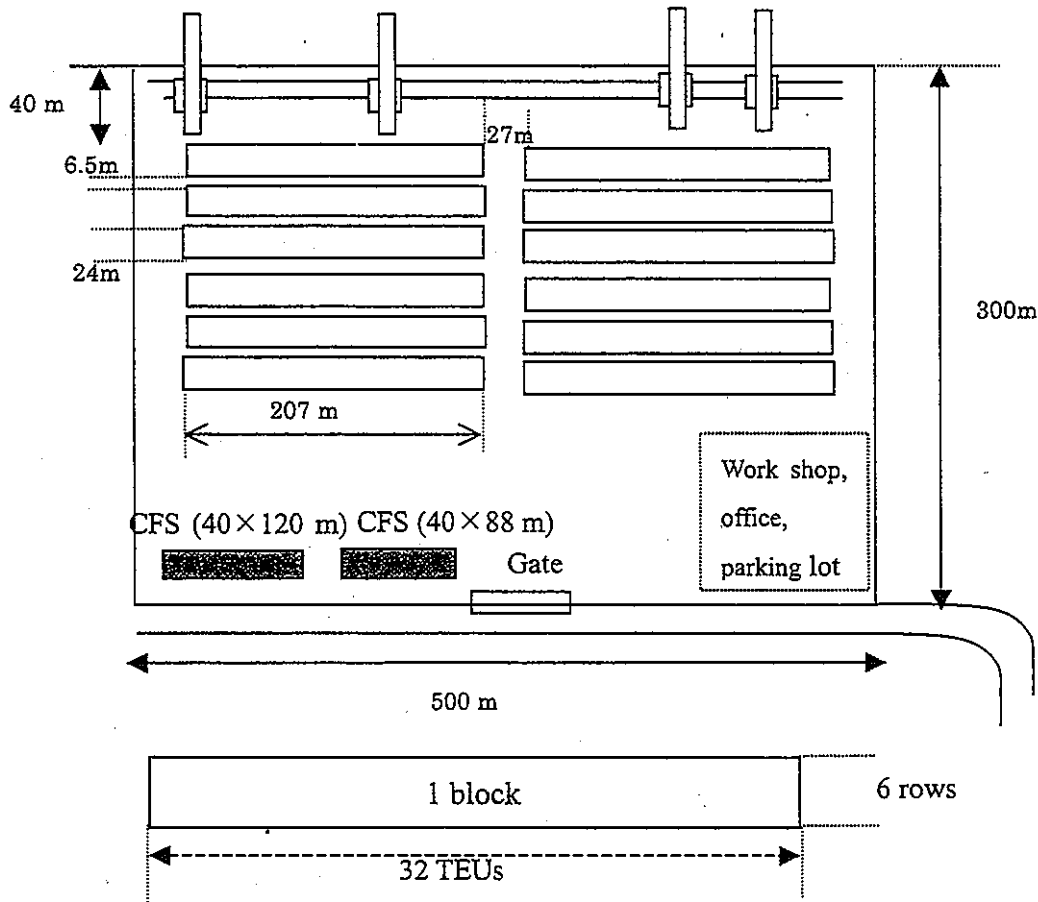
Layout Plan of Palaran Container Terminal in 2025 (6-berth scenario)
